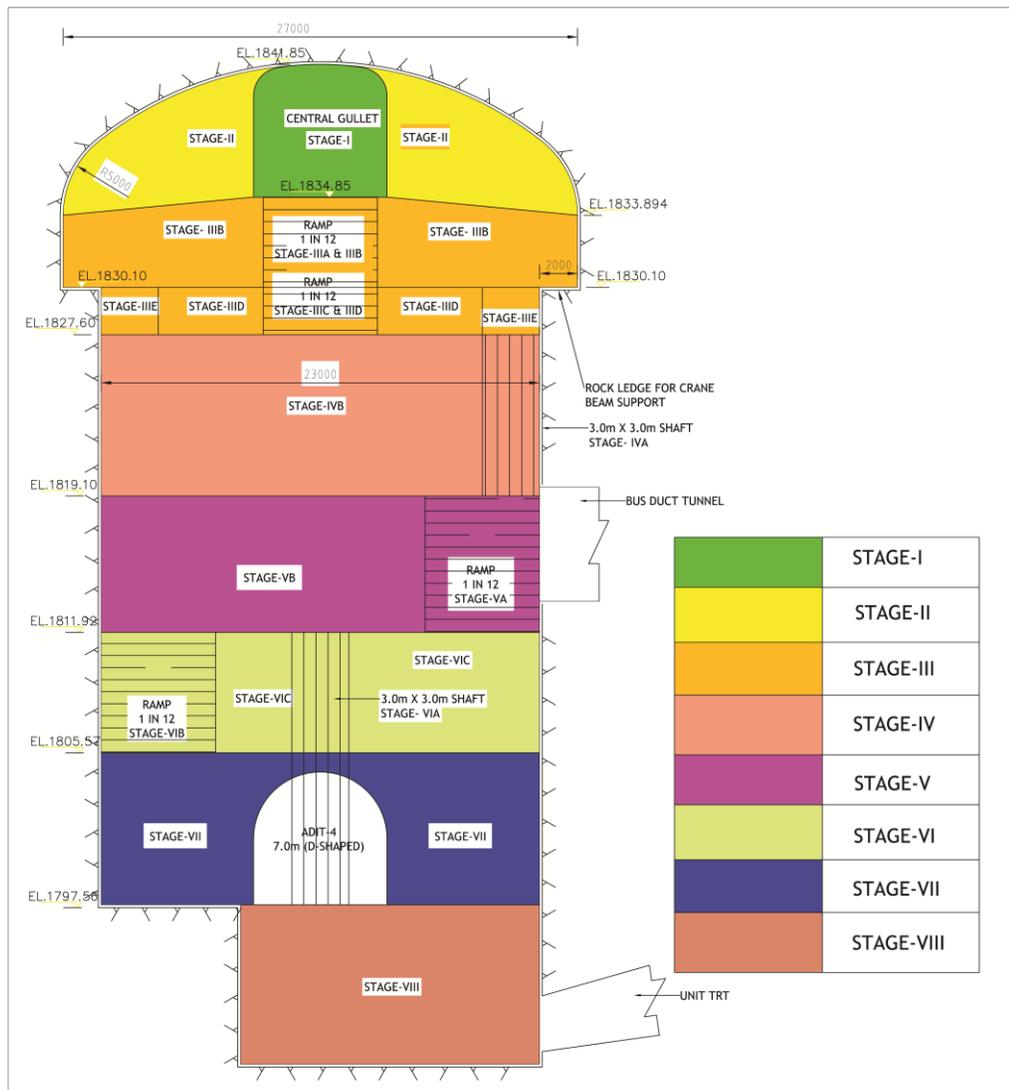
Sequence of stages adopted for excavation of power house cavity.
